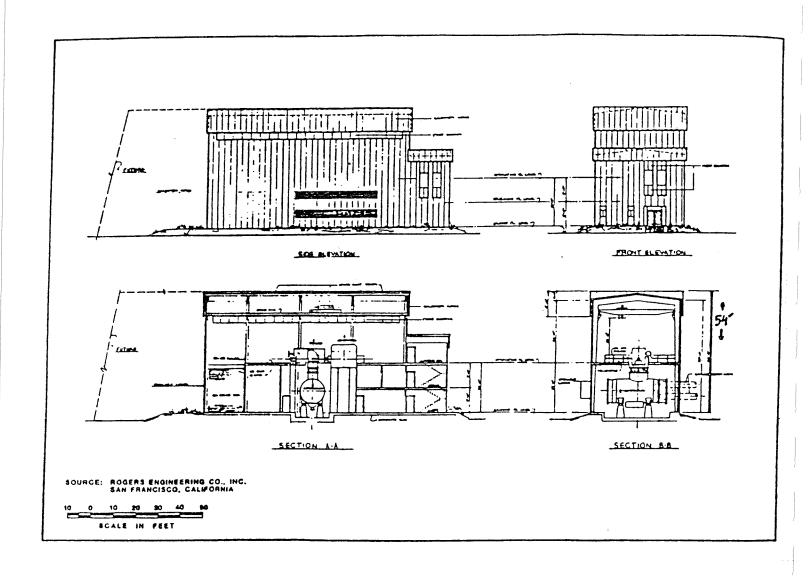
Elevations and Sections - Initial 12.5 MWe Power Plant.
